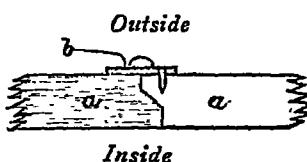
is a cross-section through the joint between the two centre styles of a casement window, showing the arrangement by which the rain is kept out. a, a are the centre styles; b is a beaded slip of wood screwed on to the outer style. Scale = $\frac{1}{8}$.
